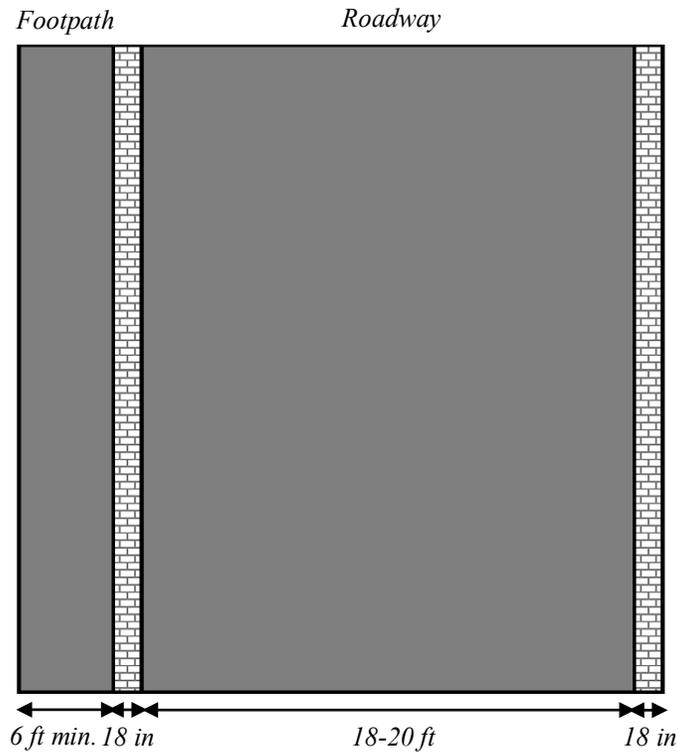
Cross-section of a Local Flow Street with Separate Pedestrian Facility, constrained right-of-way
